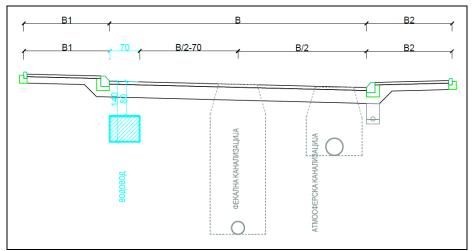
Location of the water supply system in street profile - placed on the higher side of the street Source: Main project for linear infrastructural construction – construction of water supply system in ARM district 1
